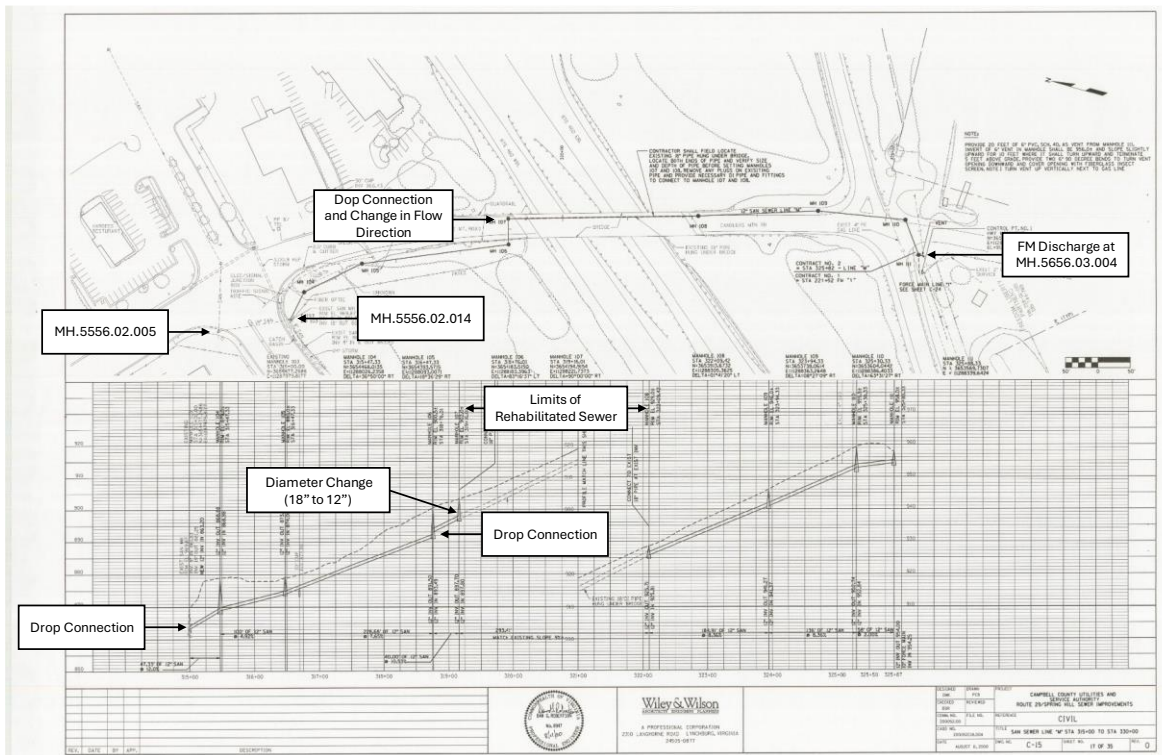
Candler Mountain Road Outfall Sewer Profile
